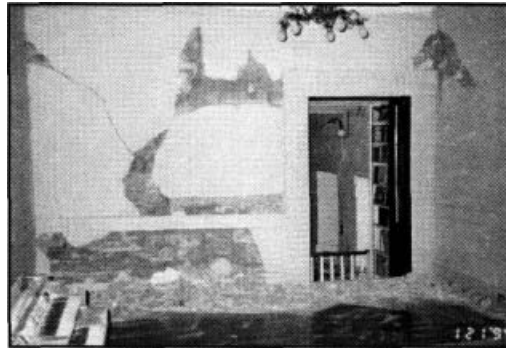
Interior cross wall on west side of library. Diagonal shear cracks start at upper left and a gap between this wall and the exterior wall opened as shown on the right. The damage in the center of the wall reveals infilled openings, one above the other.
